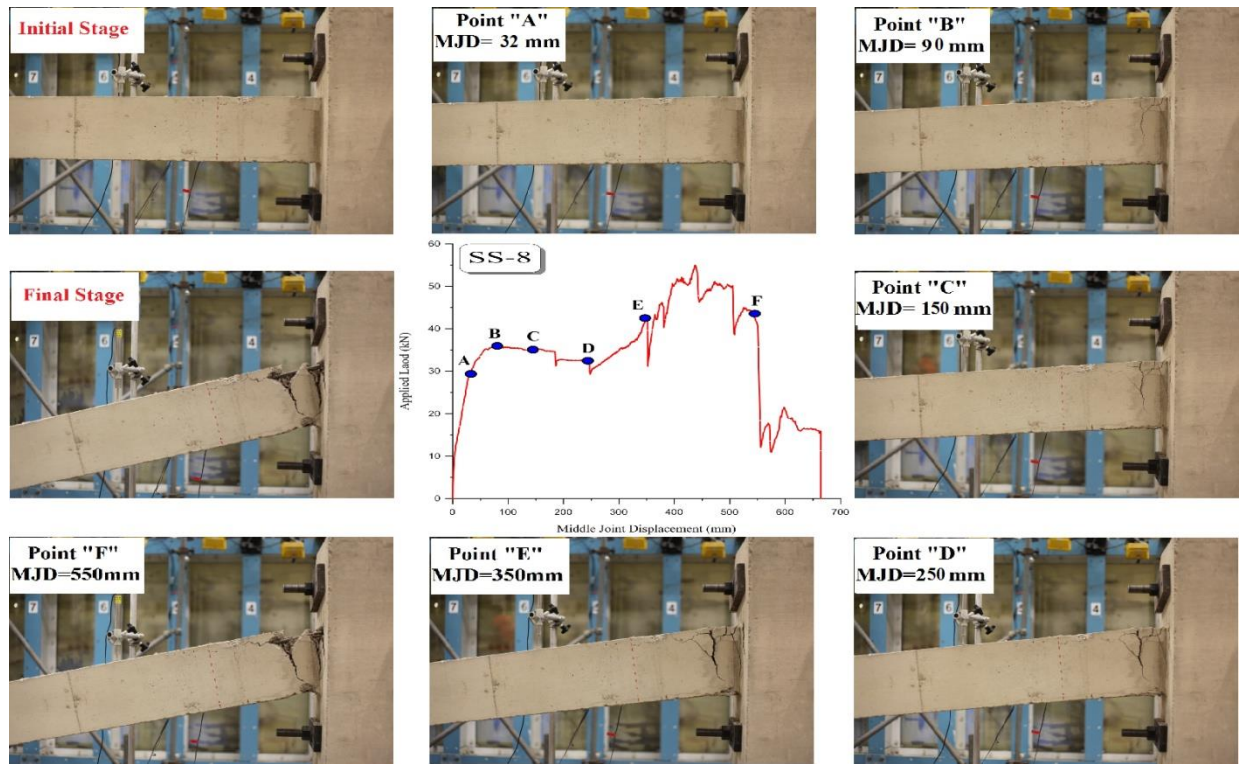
Crack Development at different stages for right beam end of specimen SS-8
